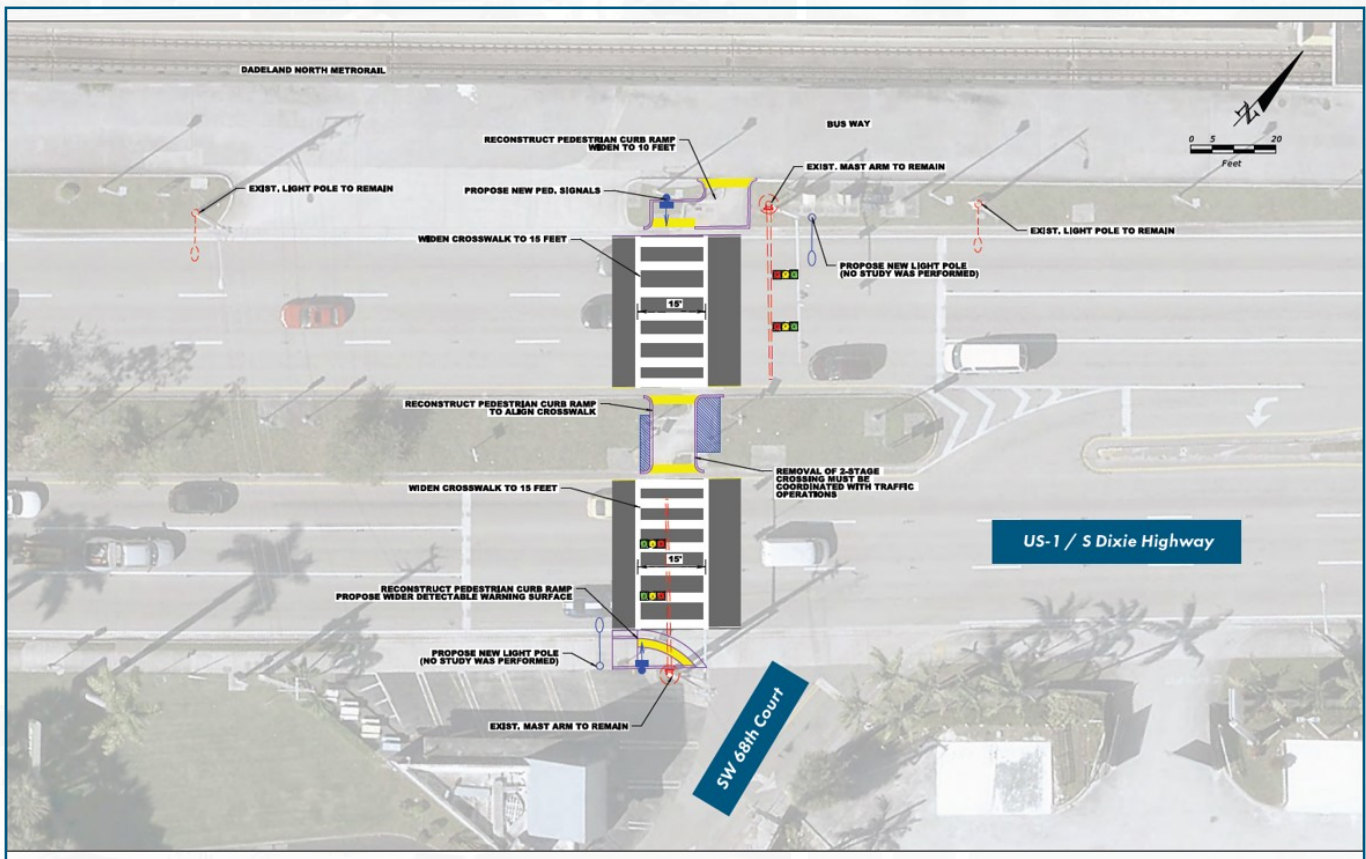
Dadeland North Metrorail Station Alternative 4: At-Grade Improvements at SW 68th Street
